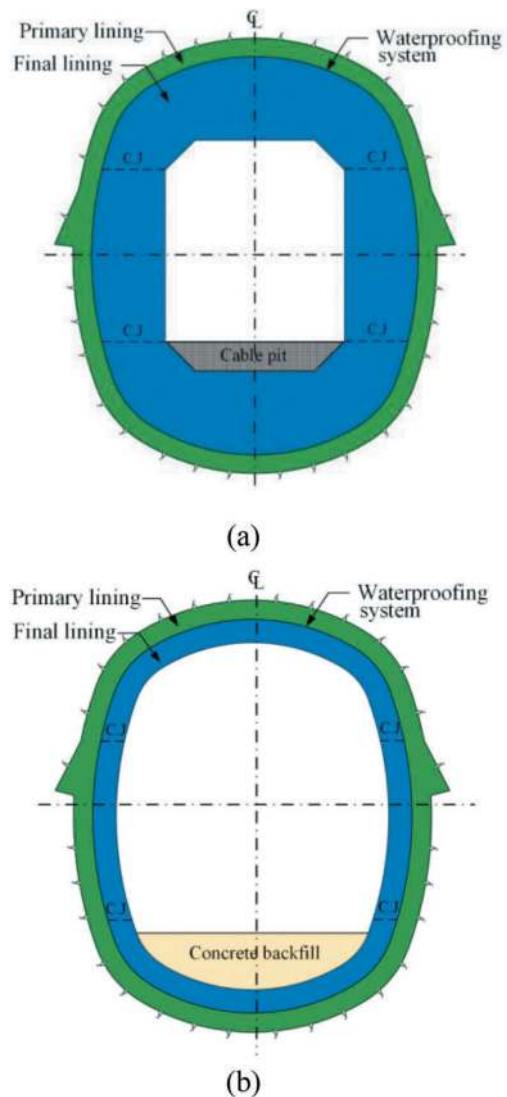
Final lining profiles; (a) collar section, (b) tunnel section.
